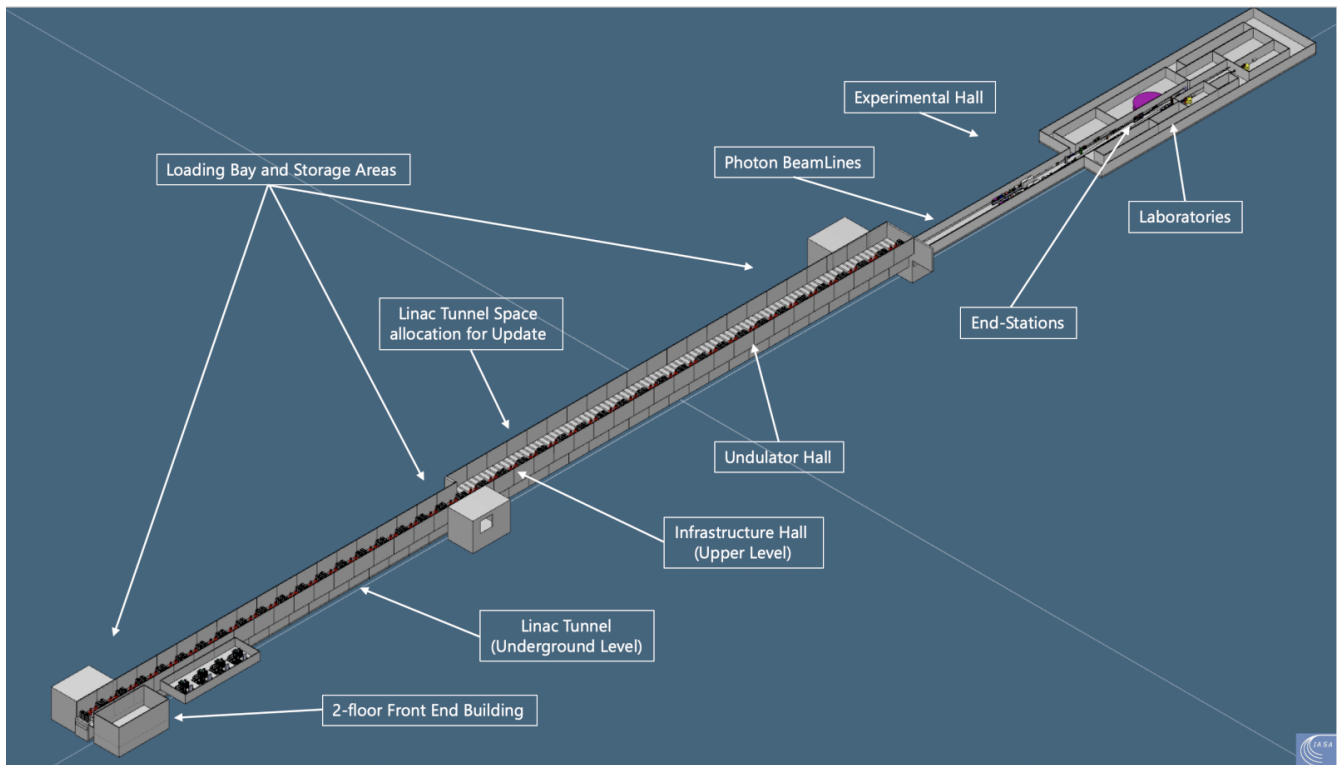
ISO View of the XLS facility with the proposed buildings Naming scheme. Facility building is depicted with the shielding blocks covering the Linac Tunnel.
